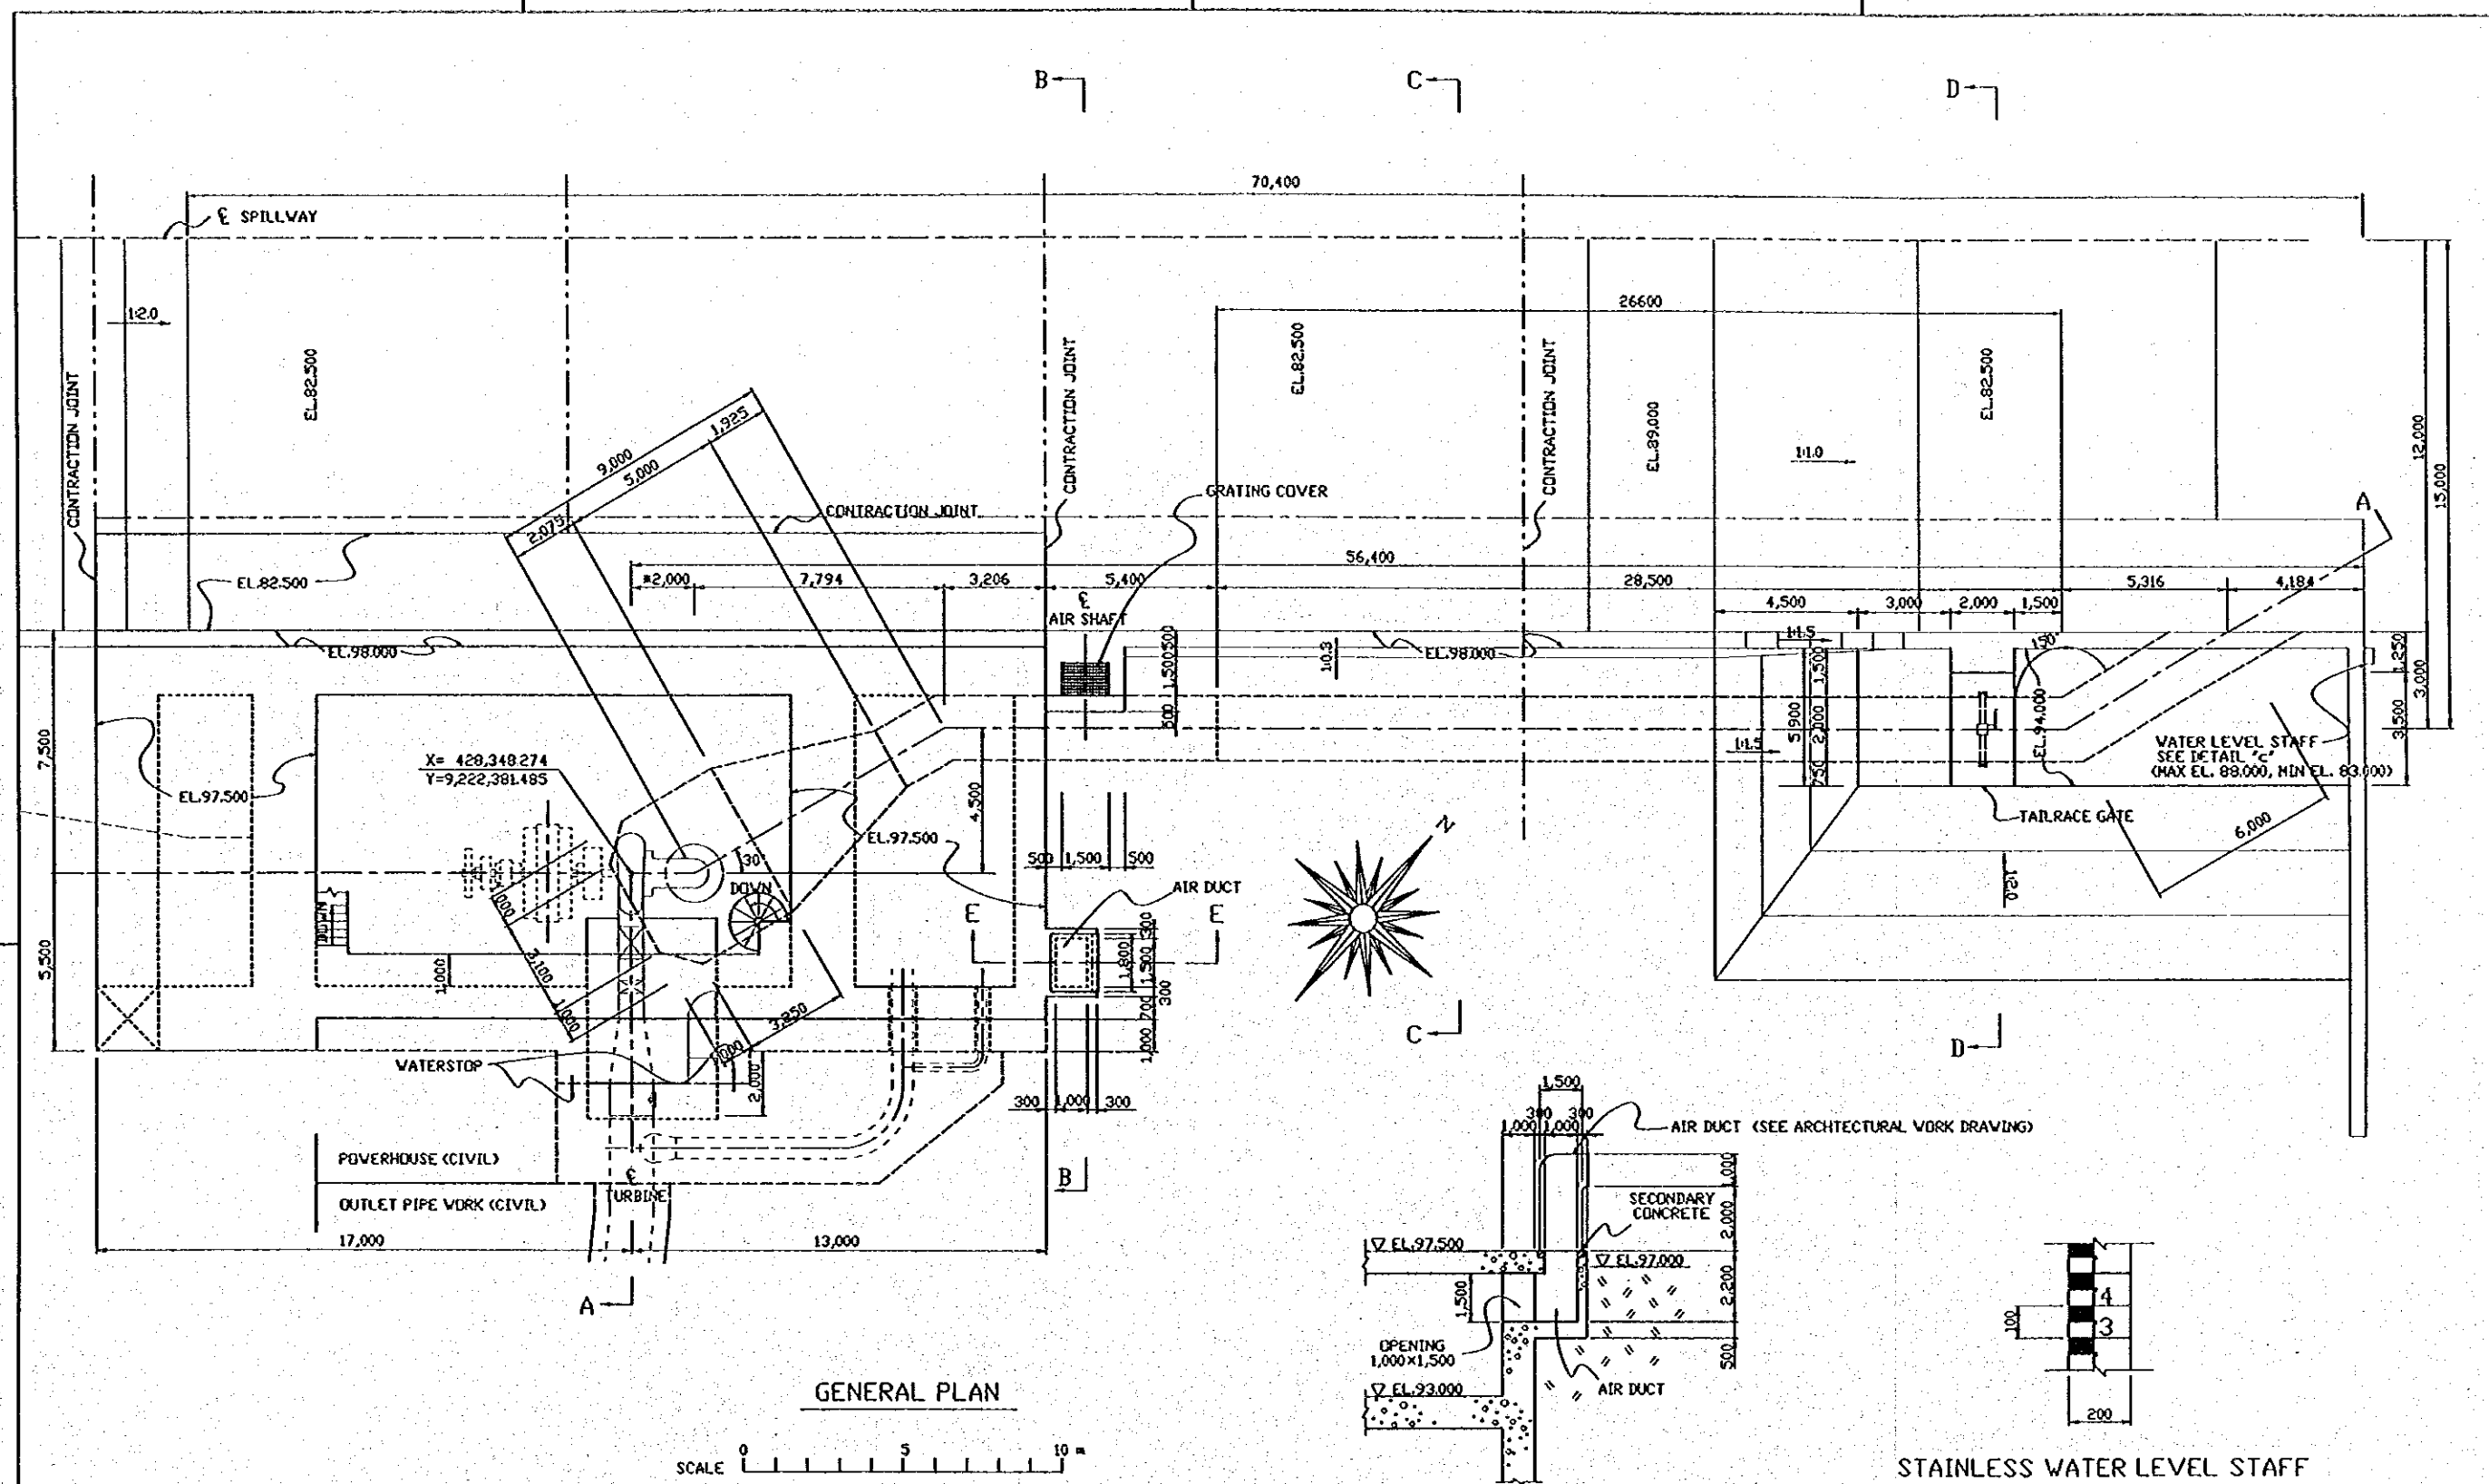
Powerhouse Concrete Outline - Plan
